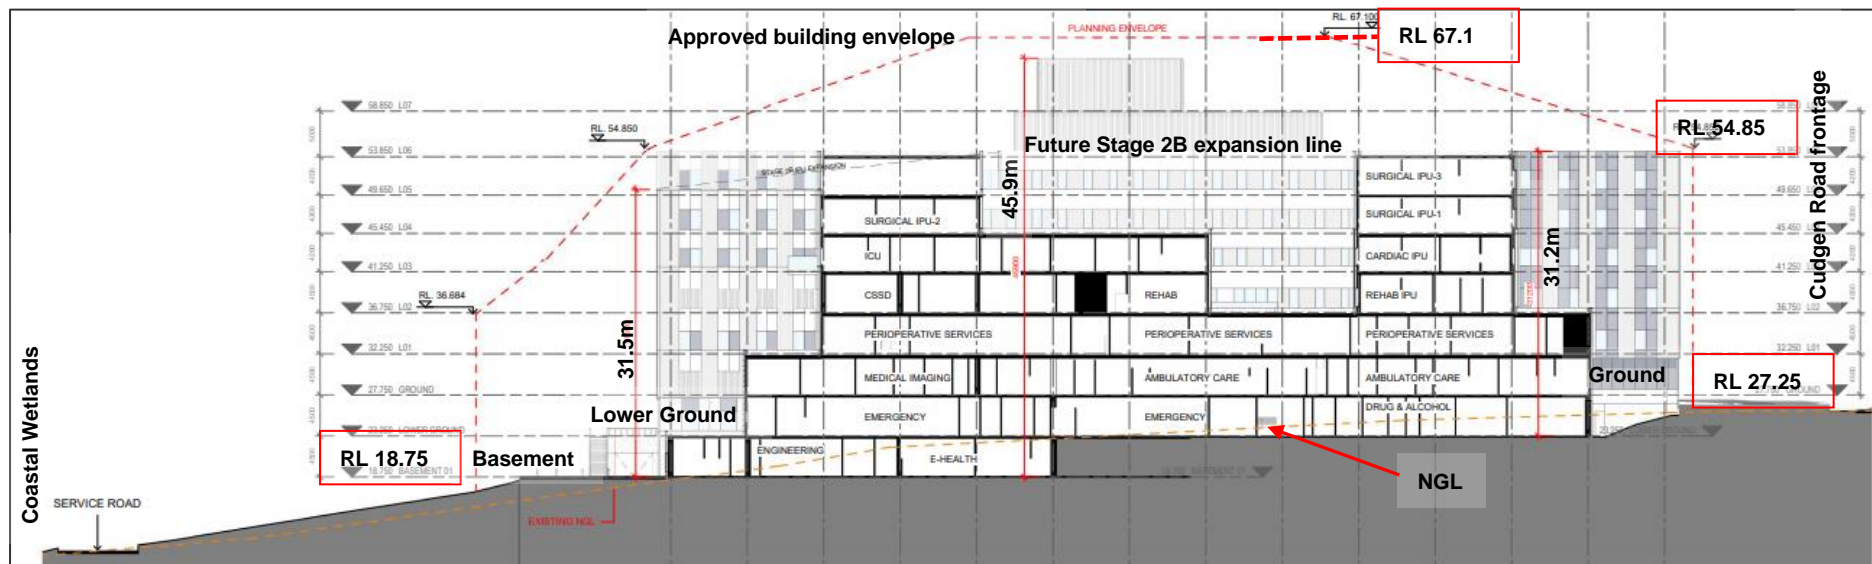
| North-South section through the new hospital building identifying the emergency / IPU areas and stepping of building (Source: Applicant's RTS)
